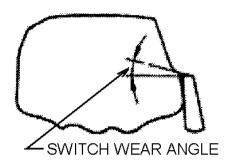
Stock rail side wear and switch blade width/height detail:
